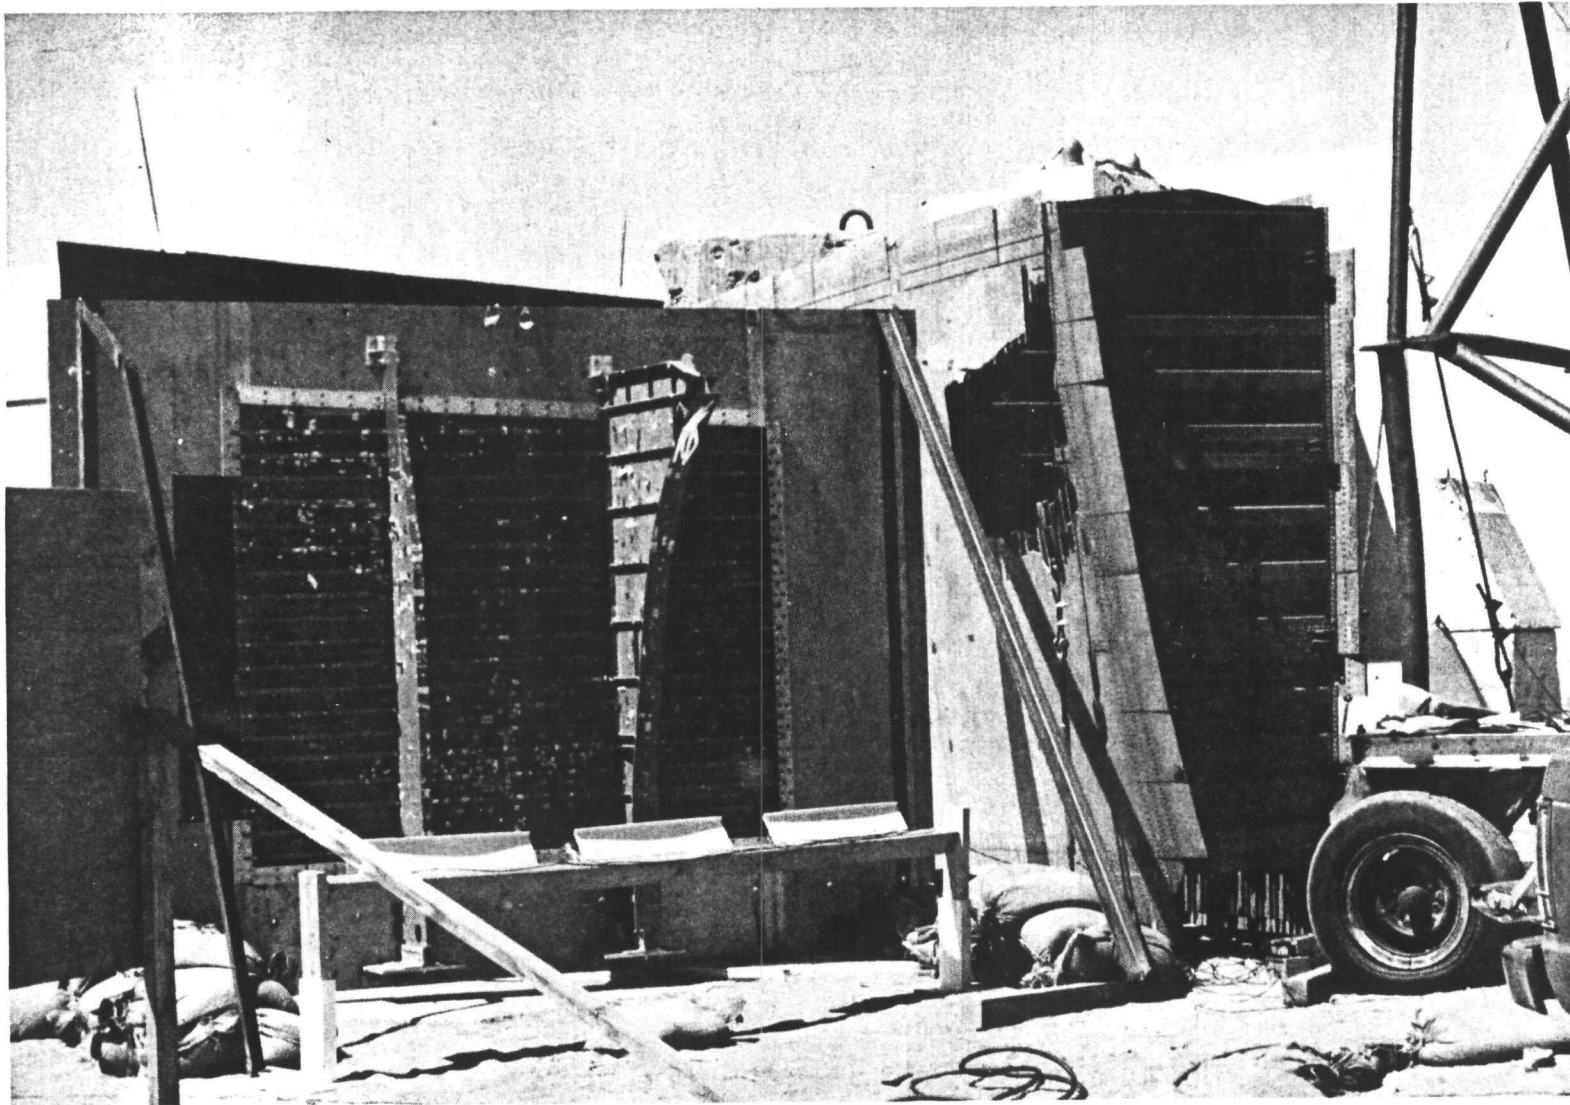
Alternate View of Sidewall Section (Rear View) - FFT-3
